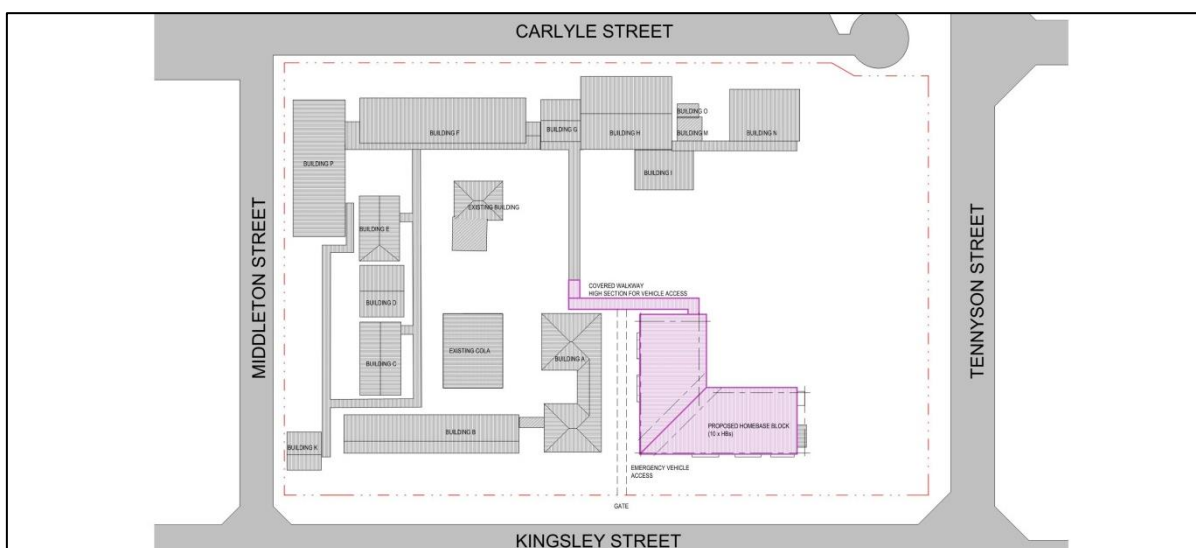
Proposed site plan of the School. (Source: Conrad Gargett)
